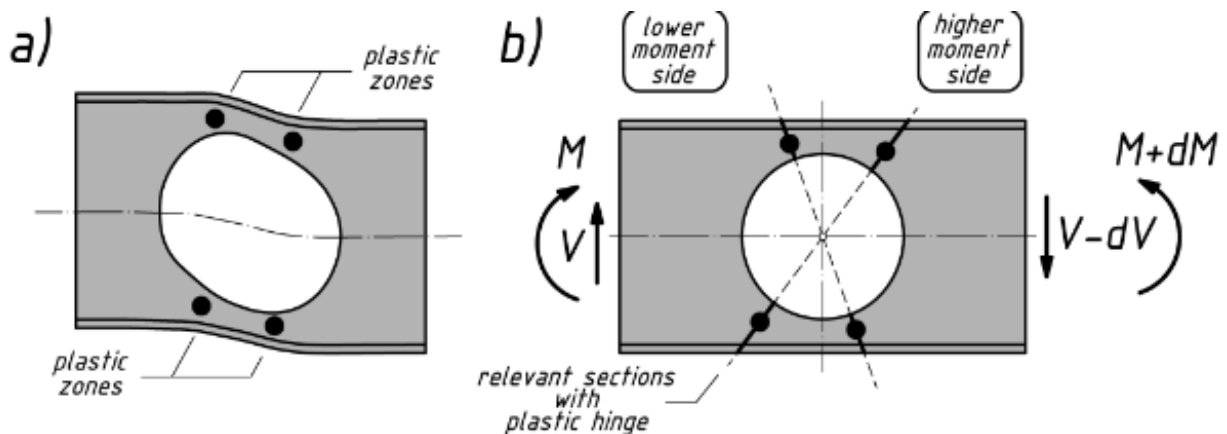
Failure mode of a cellular beam when it is subjected to the M-V interaction: a) the four-hinged failure mechanism, b) location of the relevant plastic hinges
